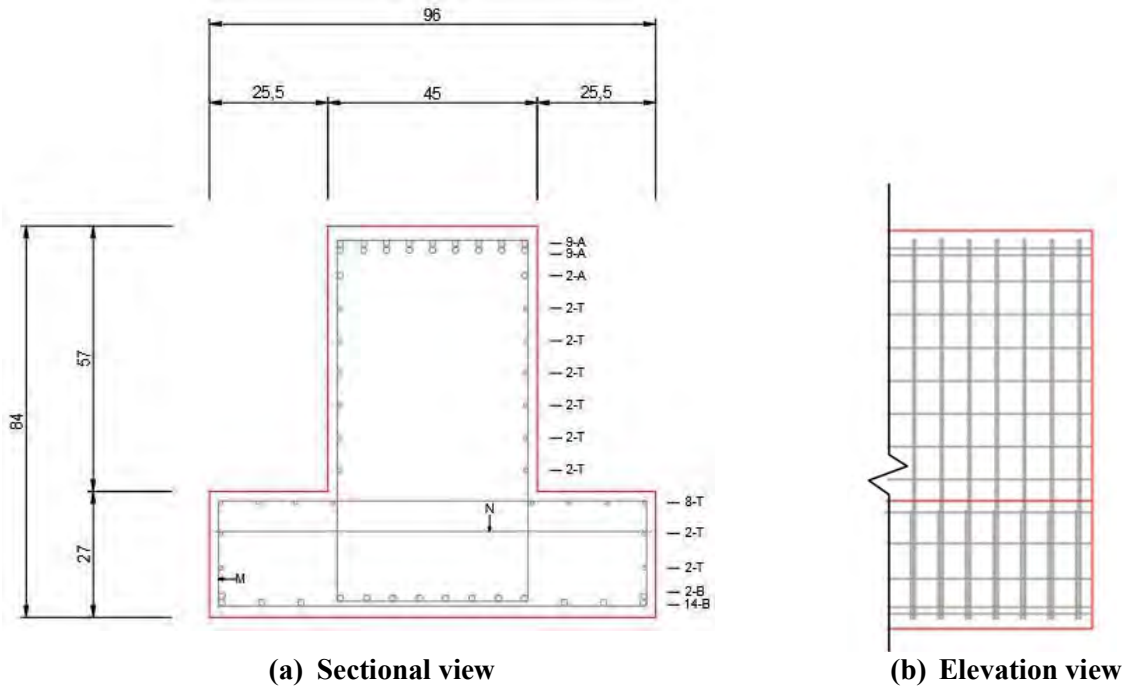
Bent 2-End View of Traditional Design Without End Bars in Case 2 (unit: inch)
